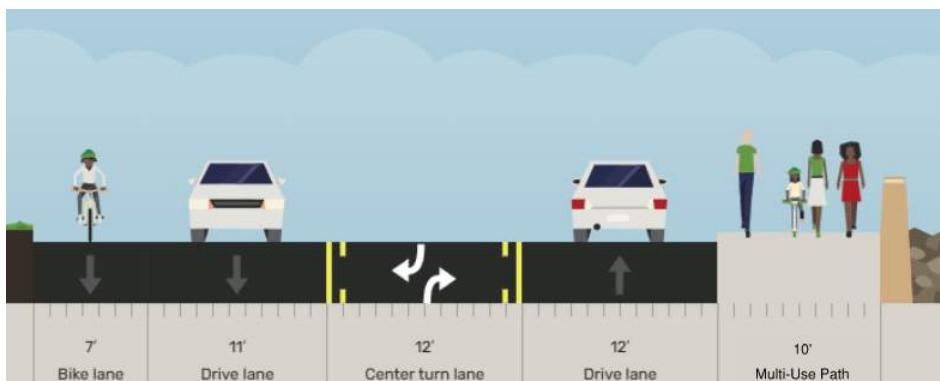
Recommended Typical Cross Section from Jerry's Flat Road to south of Harbor Way (Facing South)
